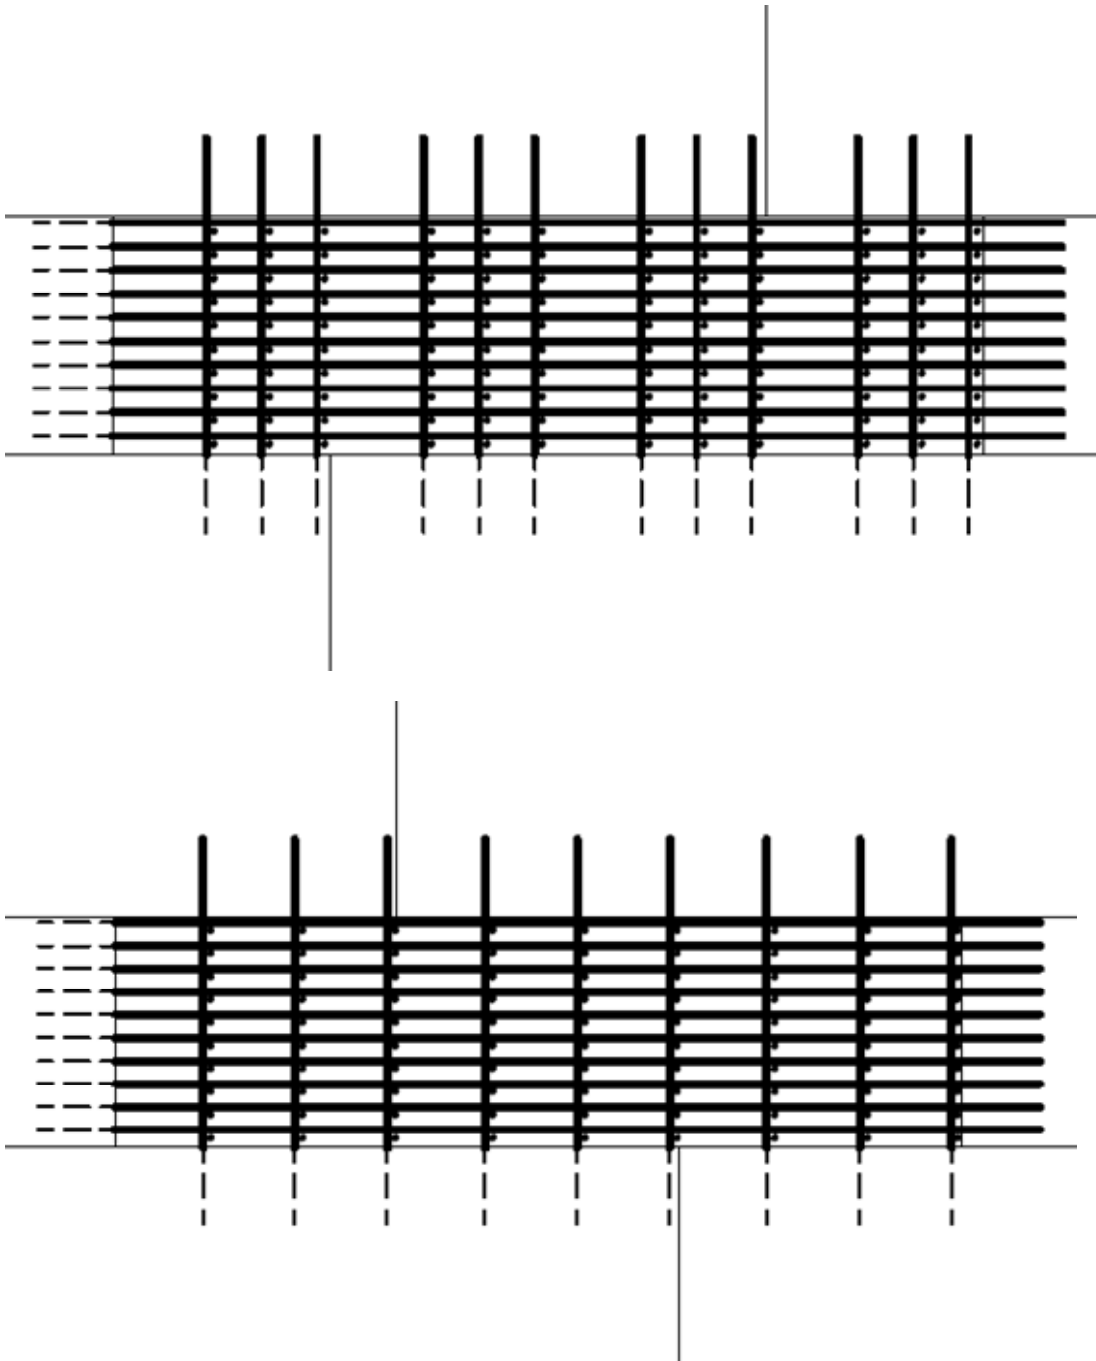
Arrangement of reinforcement 'walls' for the Calabrian (above) and Sicilian (below) anchor block.
